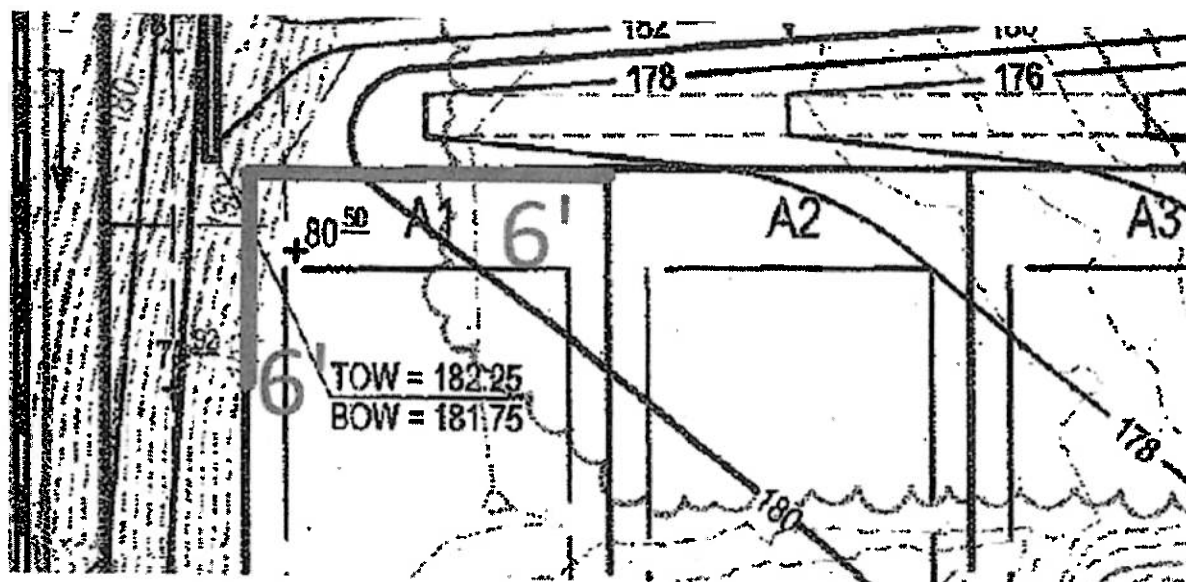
Recommended Noise Walls to Shield Rear Yards (Lot A1)
